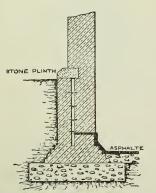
Basement with Closed Dry Area and Stone Plinth to cover Cavity.
